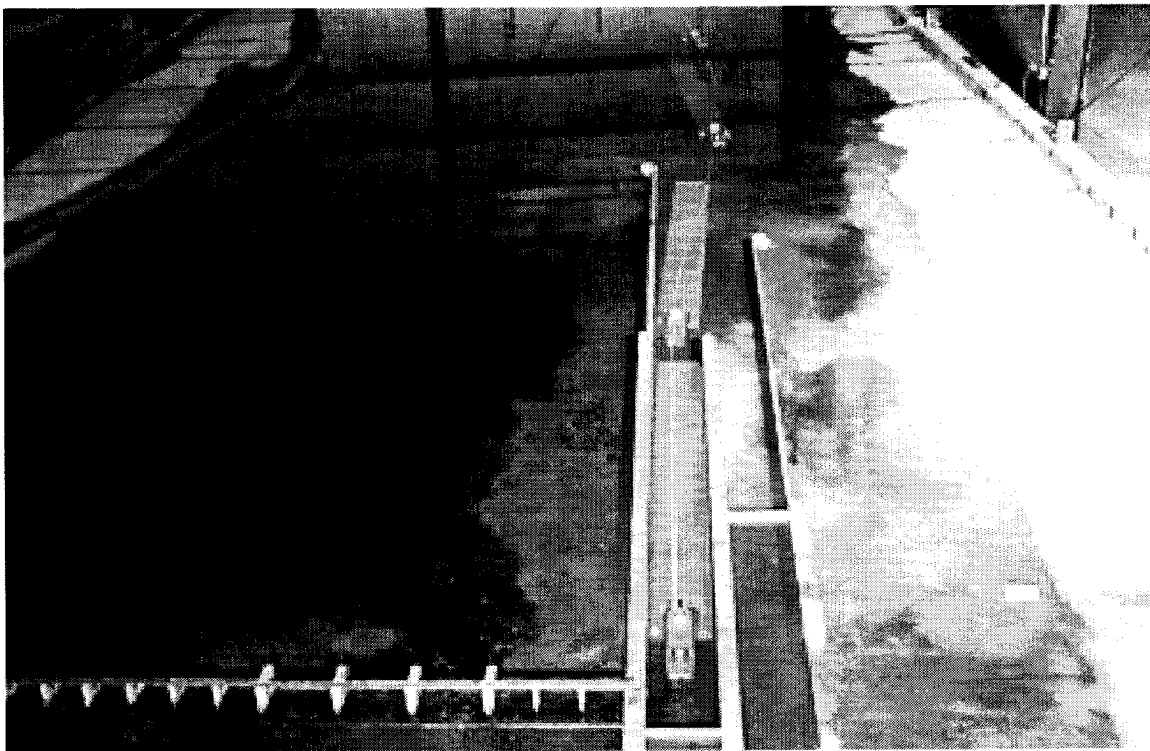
Lock Location 3. Plan A. looking downstream, discharge 162,000 cfs, showing path of downbound tow leaving 1,200-ft lock
